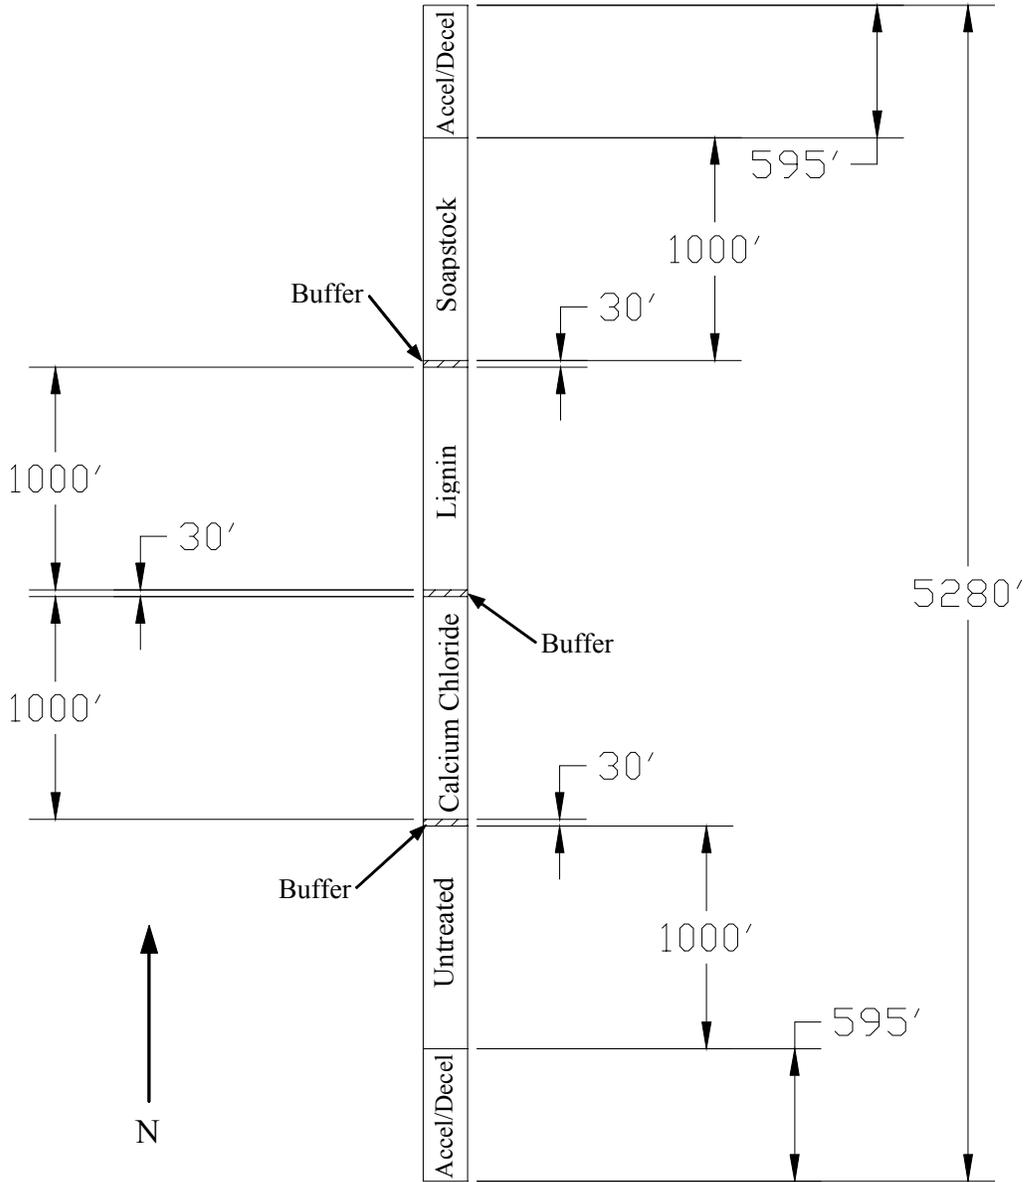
South 530<sup>th</sup> Avenue test section plan.
